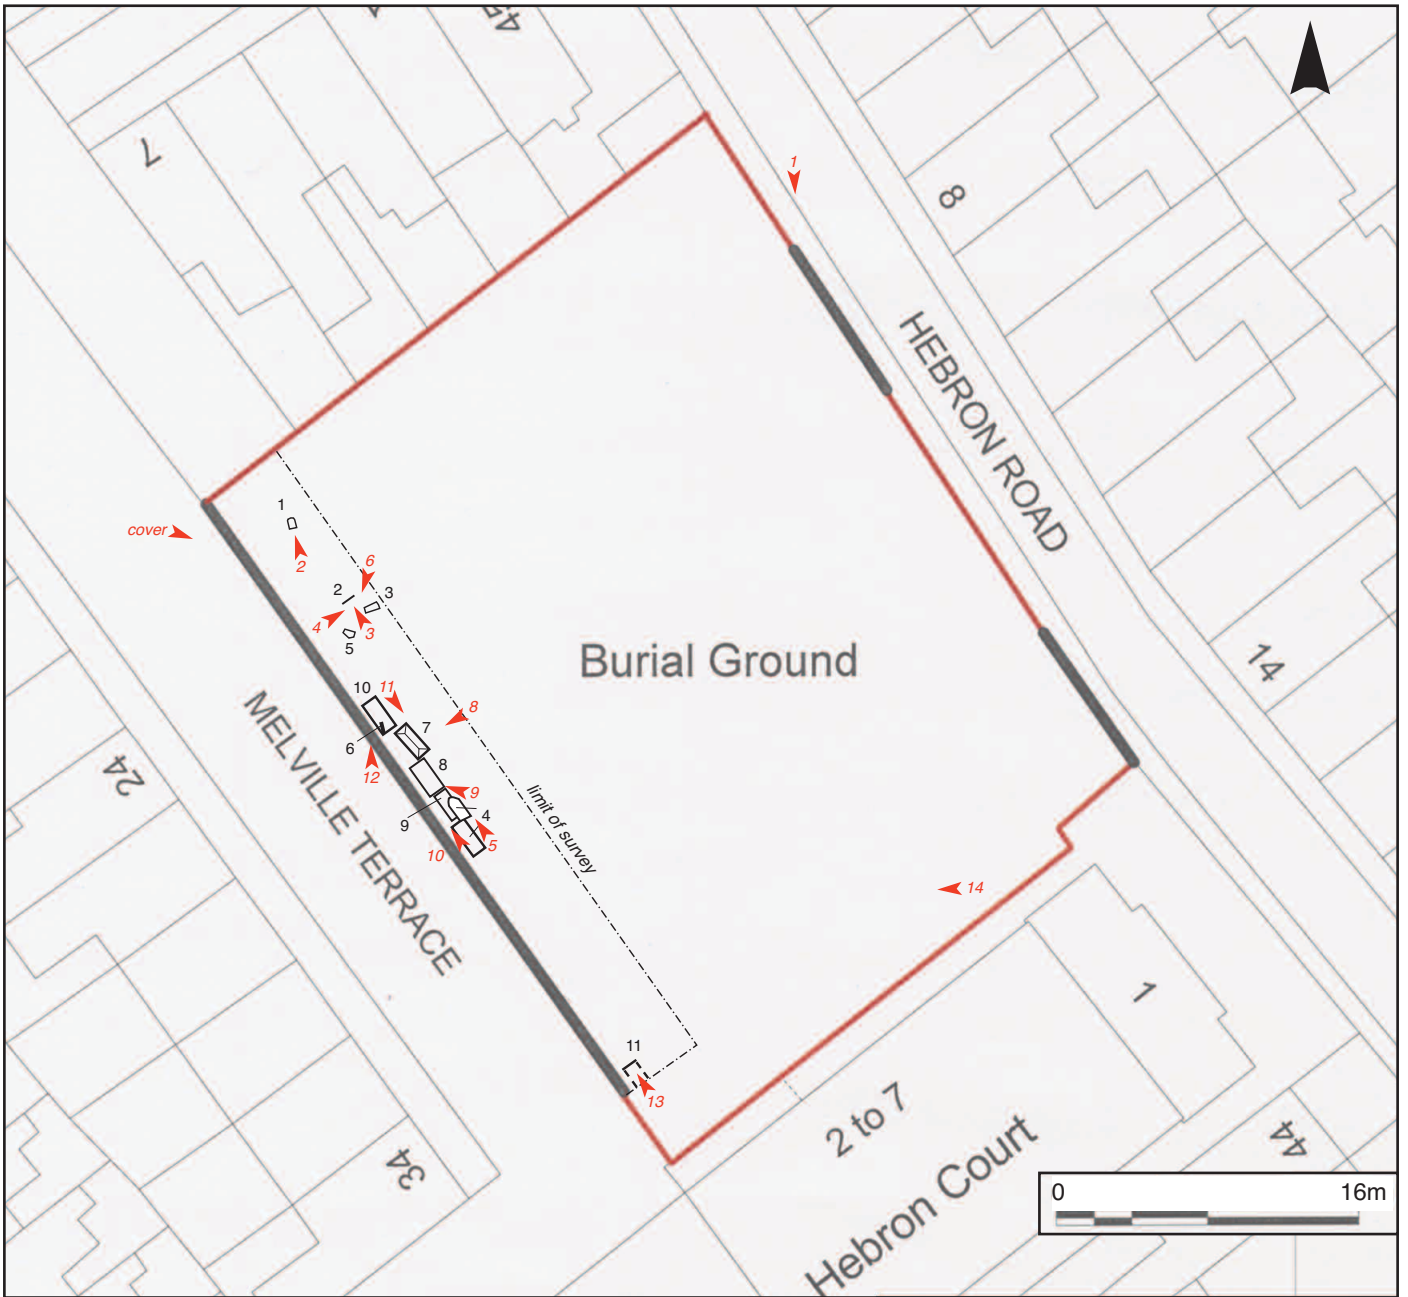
Site plan, scale 1:400, showing new boundary wall trench locations (in black), surveyed burial monuments and plate directions (in red)
